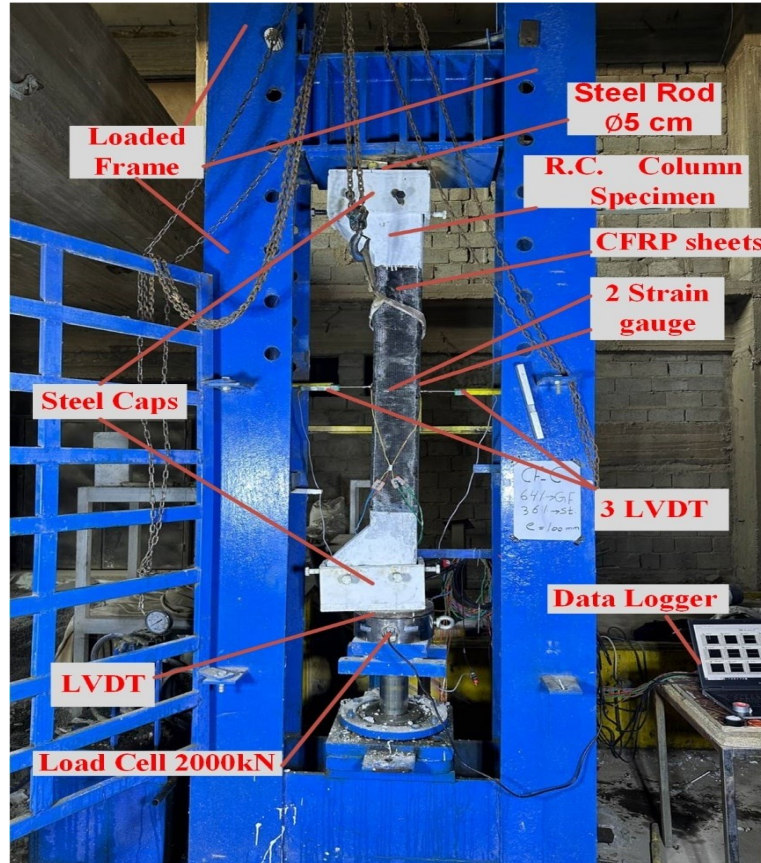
Test Machine with All Details Used in the Experimental Test of the Present Study.
